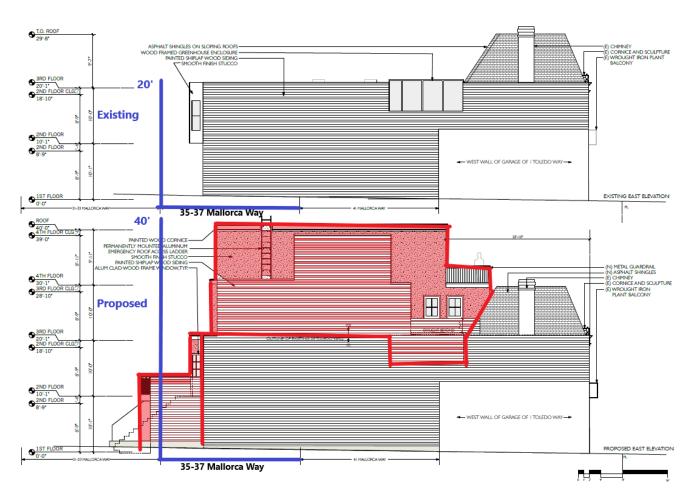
Drawing showing the portion of the existing 20' building and proposed 40' building adjacent to the rear of our home at 35-37 Mallorca
